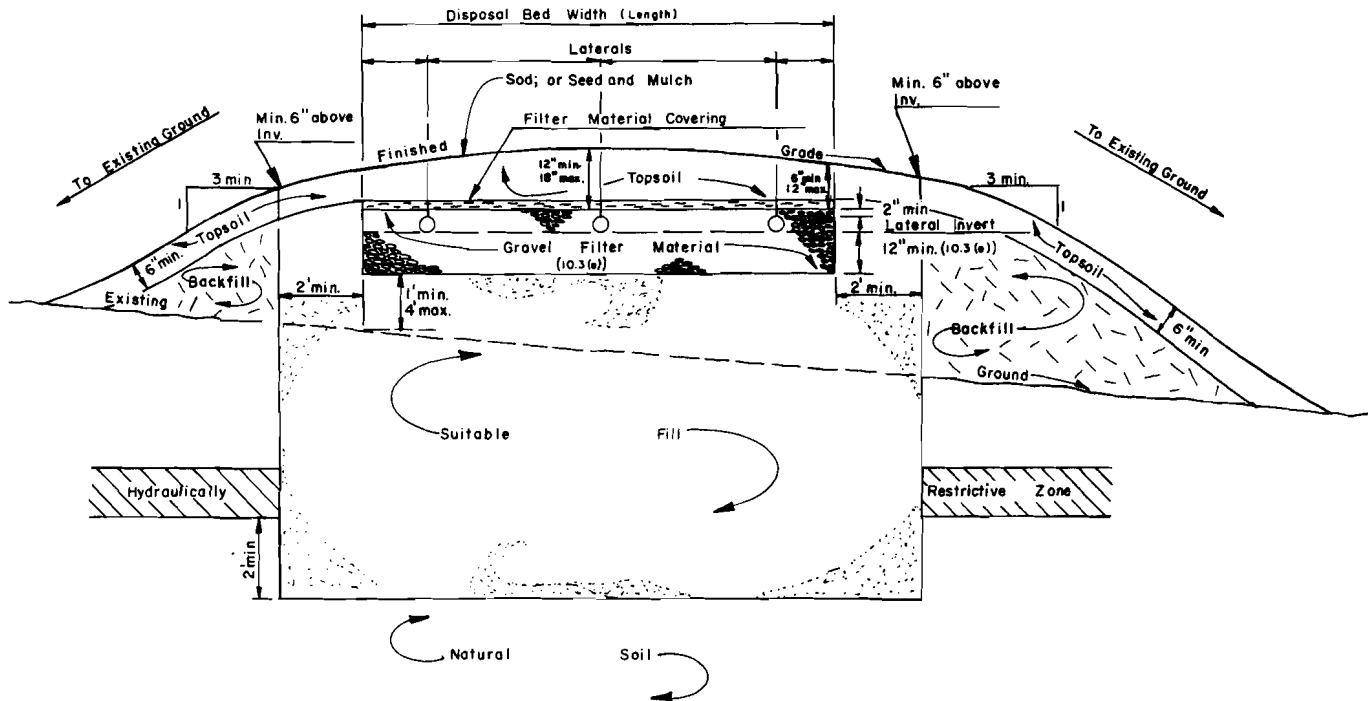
Mounded Soil Replacement Disposal Field Installation.
